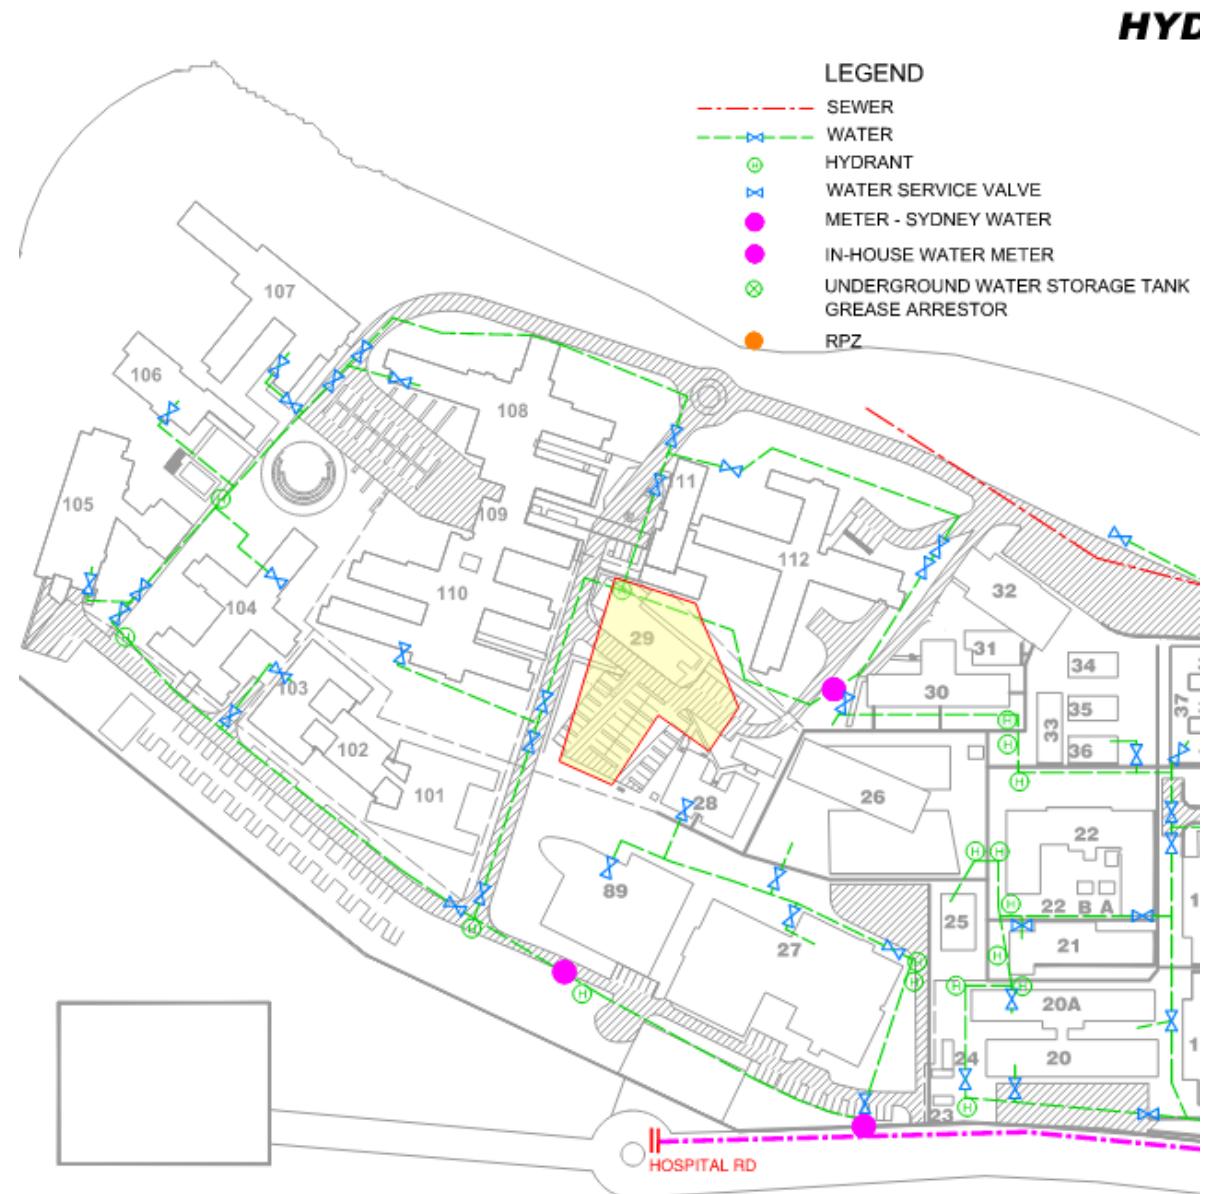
Existing Cold Water and Fire Hydrant Infrastructure
